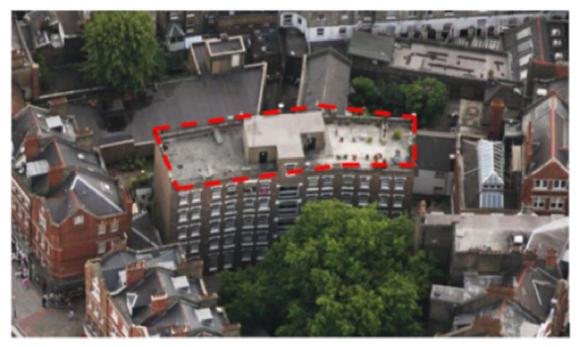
'Birds-eye' view of site and surrounding context (looking south)
